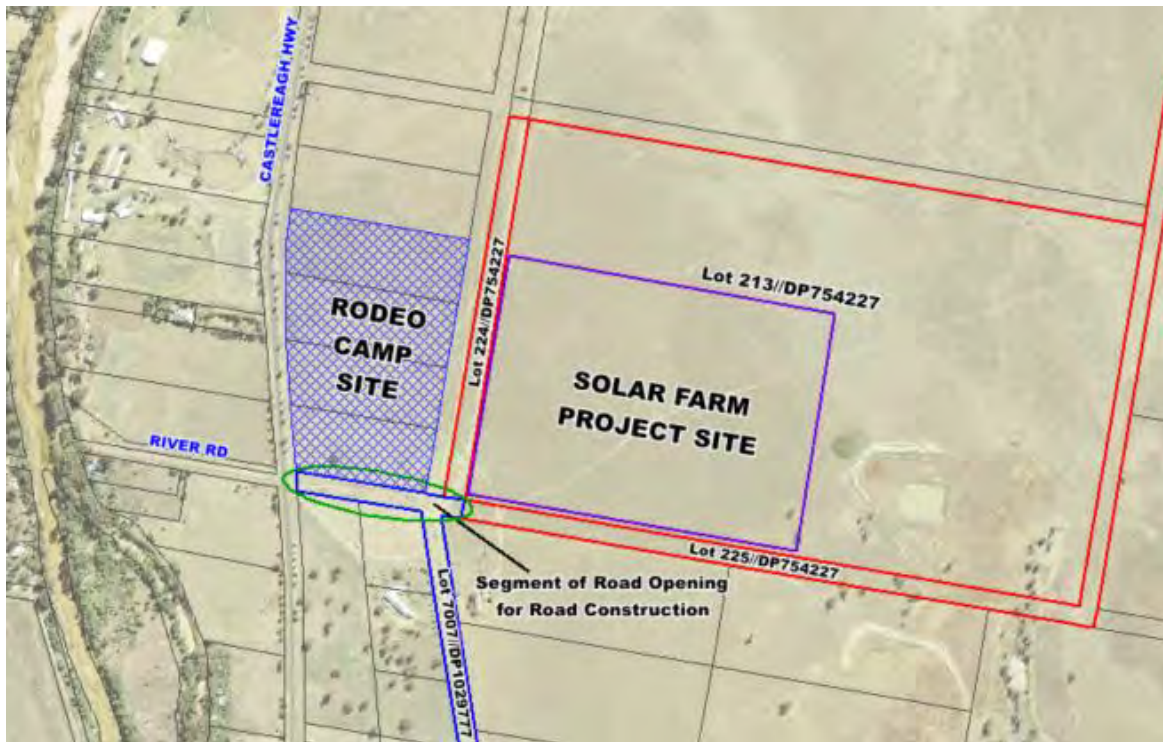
Rodeo camp site and solar farm project site sharing proposed road opening and segment of road construction.
